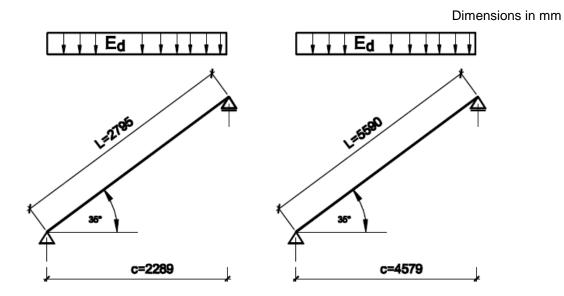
Loading scheme for roof 1, for panel length L=2795 mm and set of panels with length L=5590 mm
